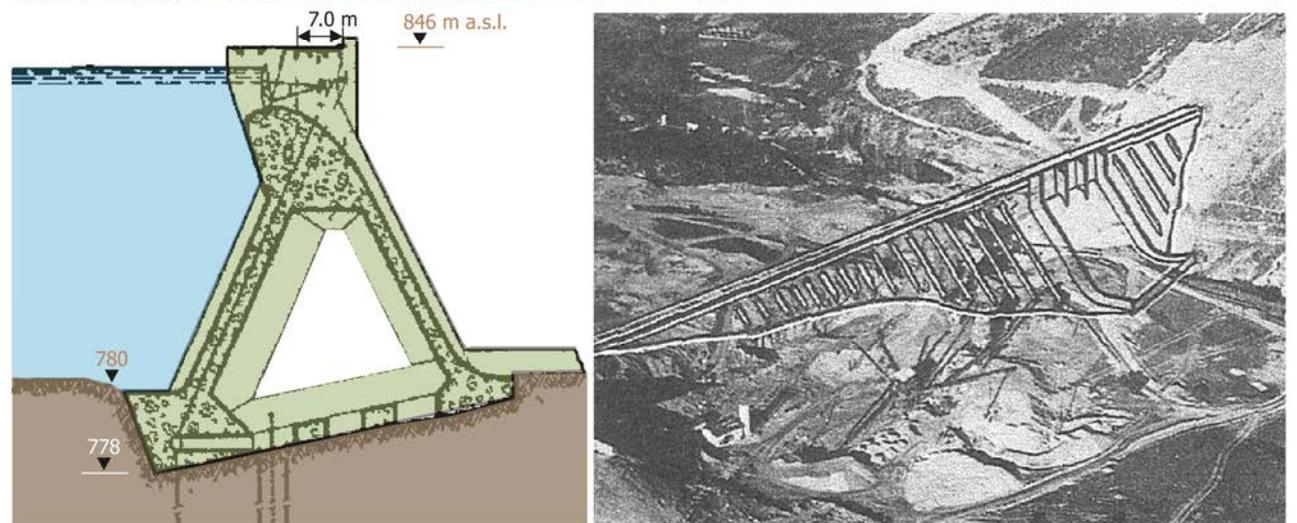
Cross section showing the structure of the Beleña multiple slab buttress dam with a conceptual view of the position of the dam on the chosen profile on the River Sorbe (adapted from “Inventario de Presas Españolas” ICOLD, 1973, a photo by P. Bláha - 2009)
